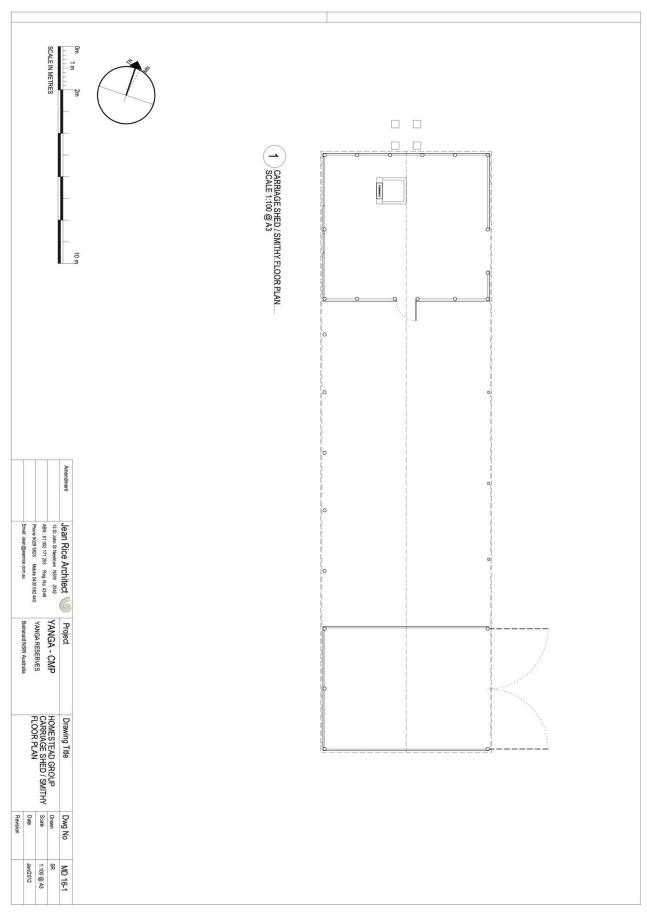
Homestead Group Carriage Shed / Smithy floor plan. Jean Rice Architect, site assessment 2009.
